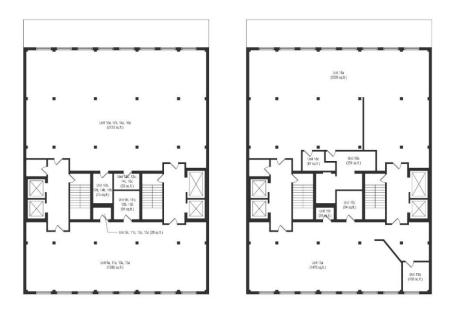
, 521 (left to right): Building 17, seventh floor (1915); same floor (1984); 1'' = 32'. North is down.
